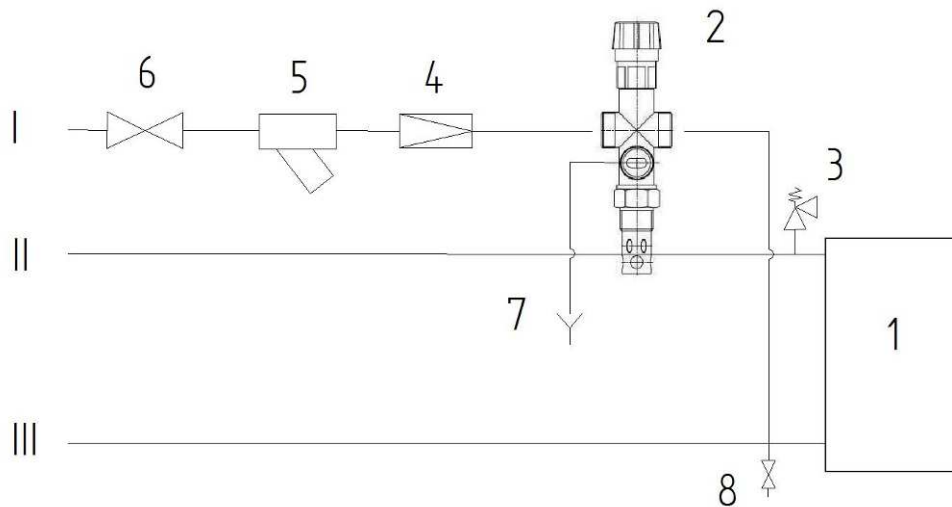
Connecting DBV 1 to Bisolid Automat Boilers
